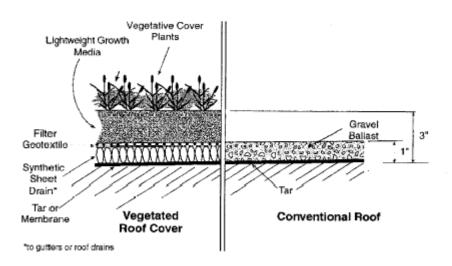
Example Vegetated Rooftop Cross-Section
